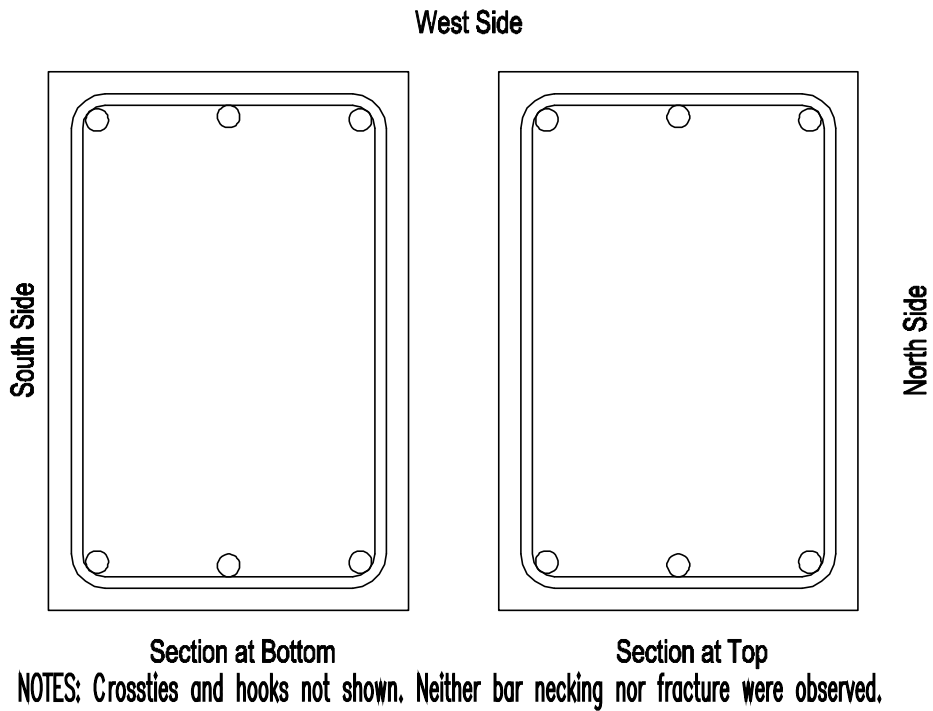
Reinforcing bar fracture locations, P100-2.5
